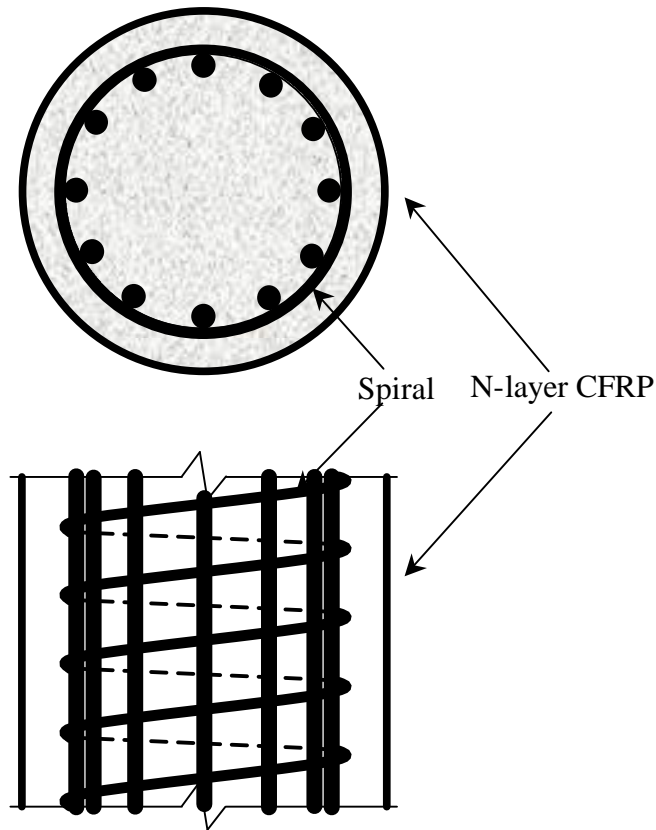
The illustration of steel reinforcement and CFRP confining concrete cylinder
